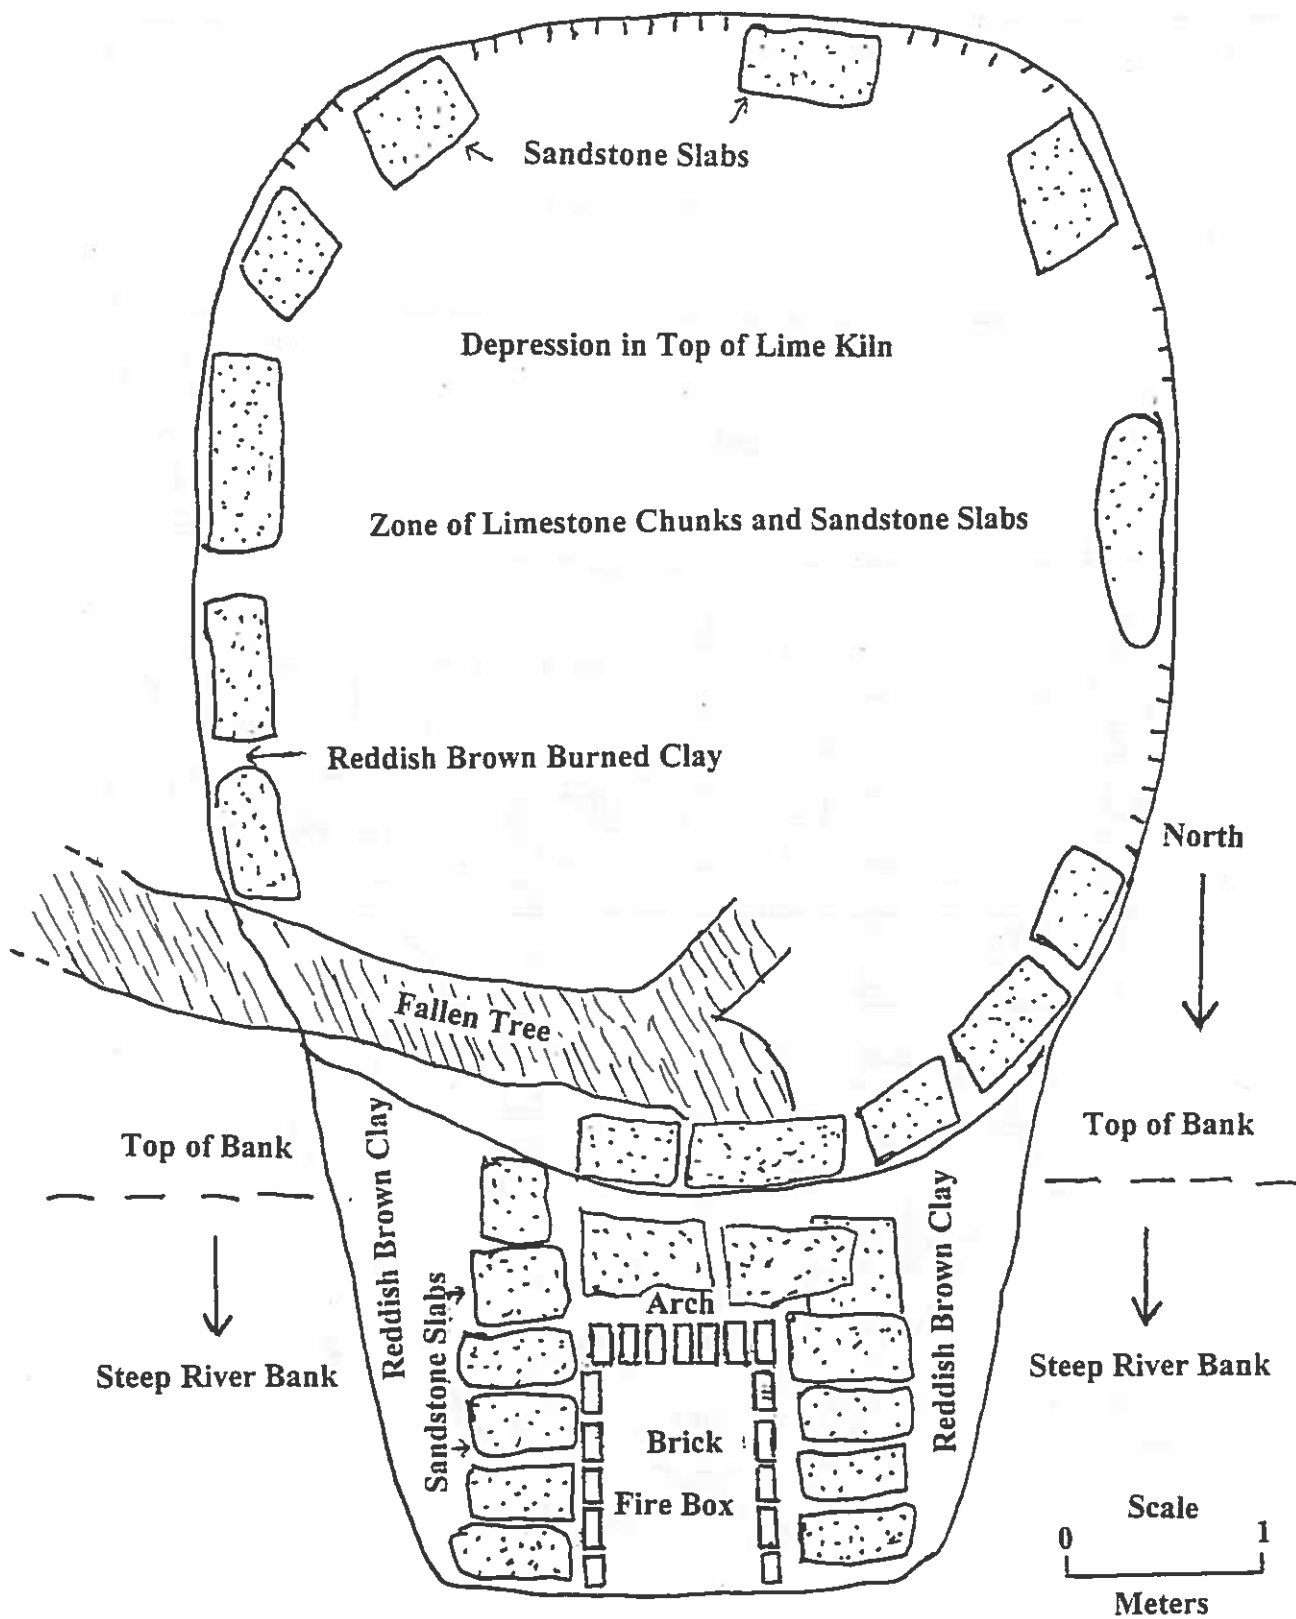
Planview Drawing Showing the Details of the Upper Rudd Lime Kiln.
